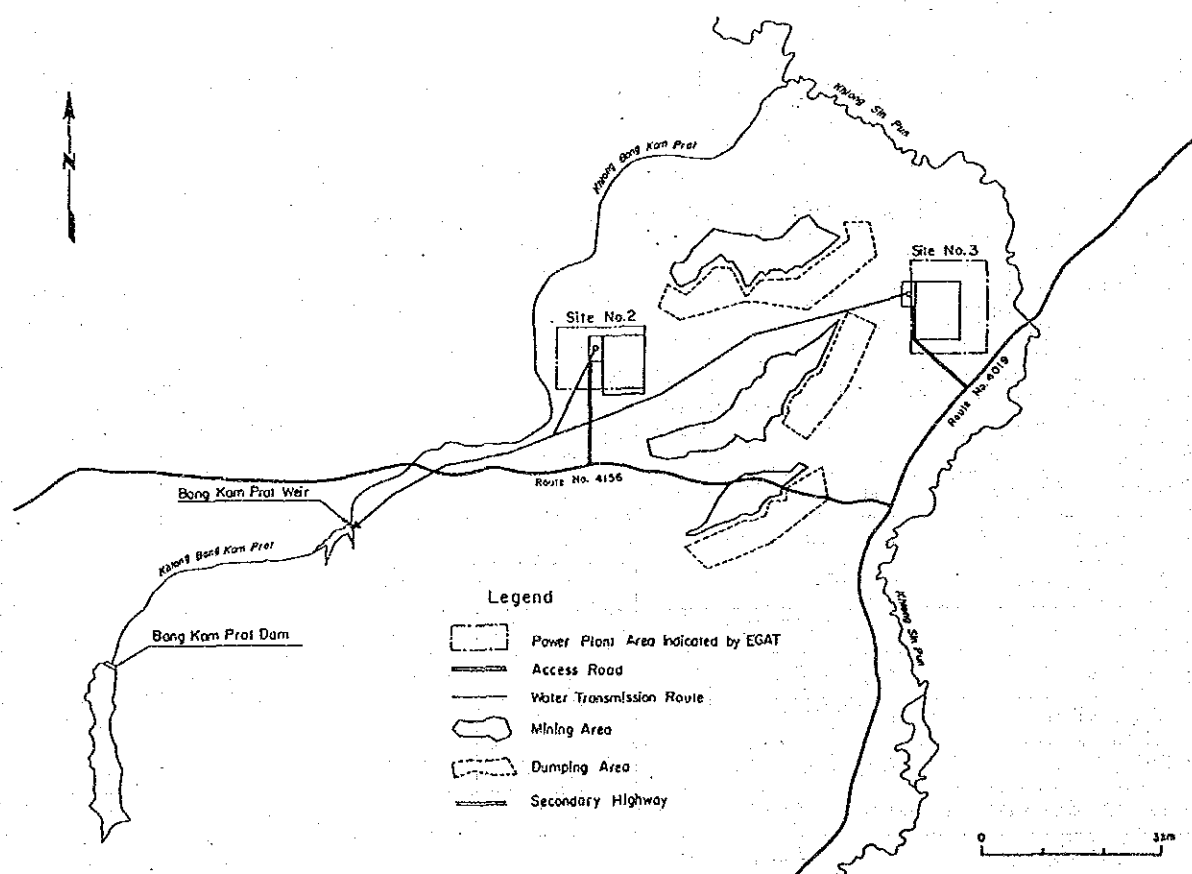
Water Transmission Route and Access Road for Site No.2 and Site No.3
